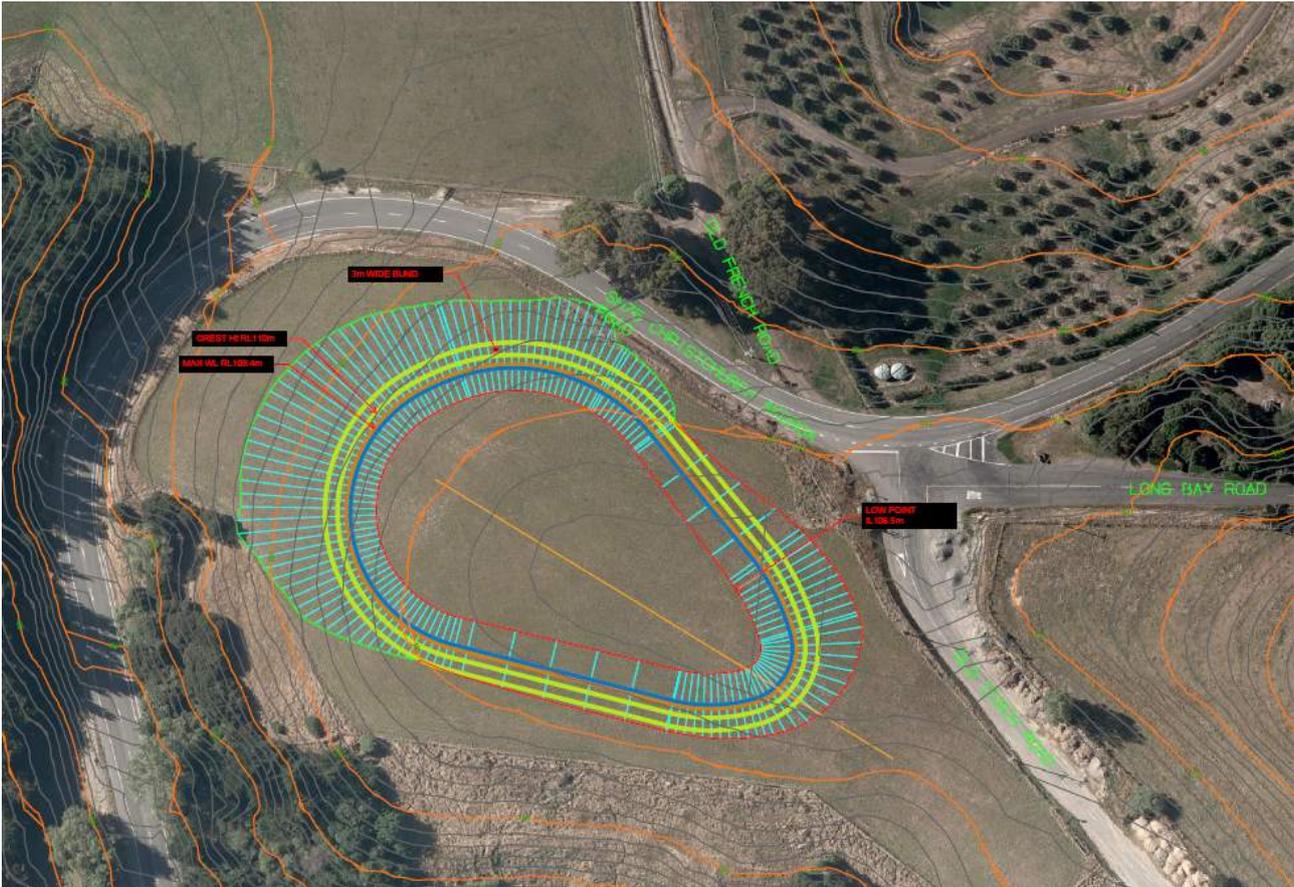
Geometric Design of Possible Storage Pond Opposite WWTP (Site 10)
